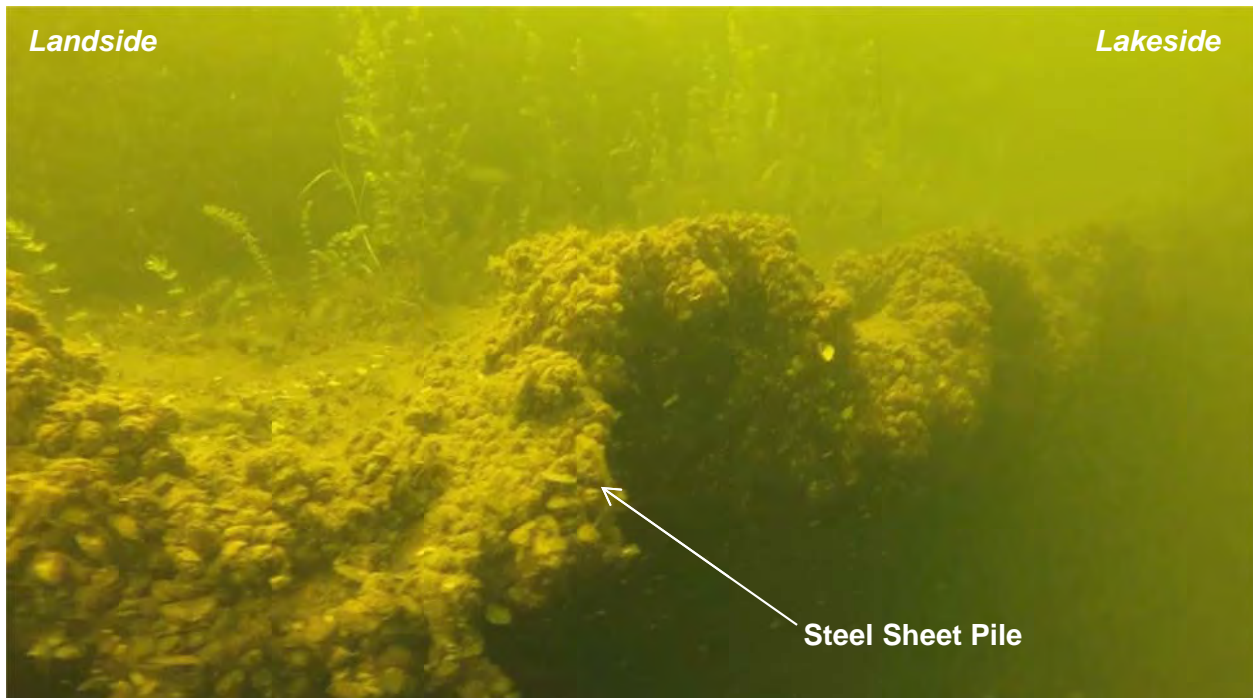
SSP separated from concrete relieving platform, East Reach
